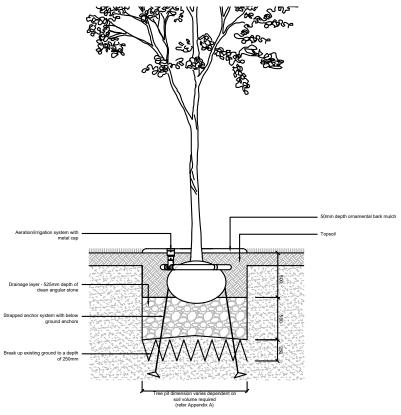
Typical detail of tree planting in areas of soft landscape
